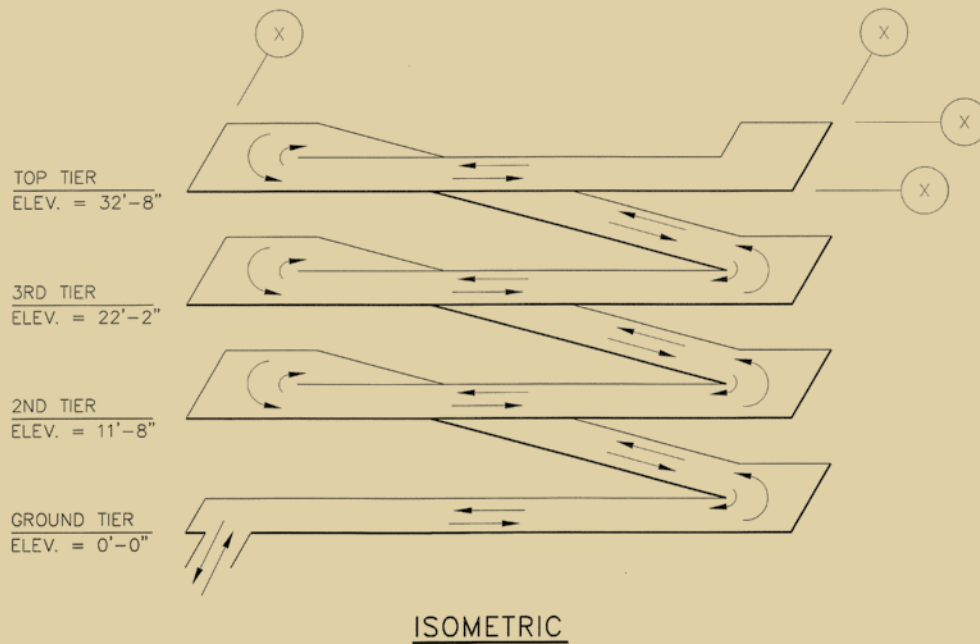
Isometric for illuminance comparison between precast concrete and post-tensioned garages.
